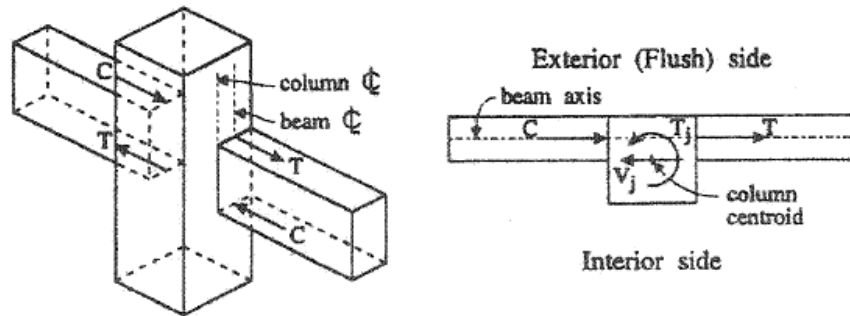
Forces Acting on Eccentric Beam-to-Column Connections (Raffaelle and Wight 1995)
